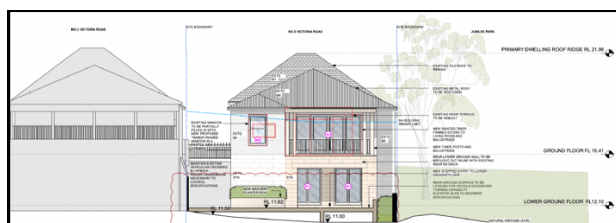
Rear elevation showing contravention (in blue dashed line) in the context of the adjacent dwelling at 1 Alexandra Lane.
